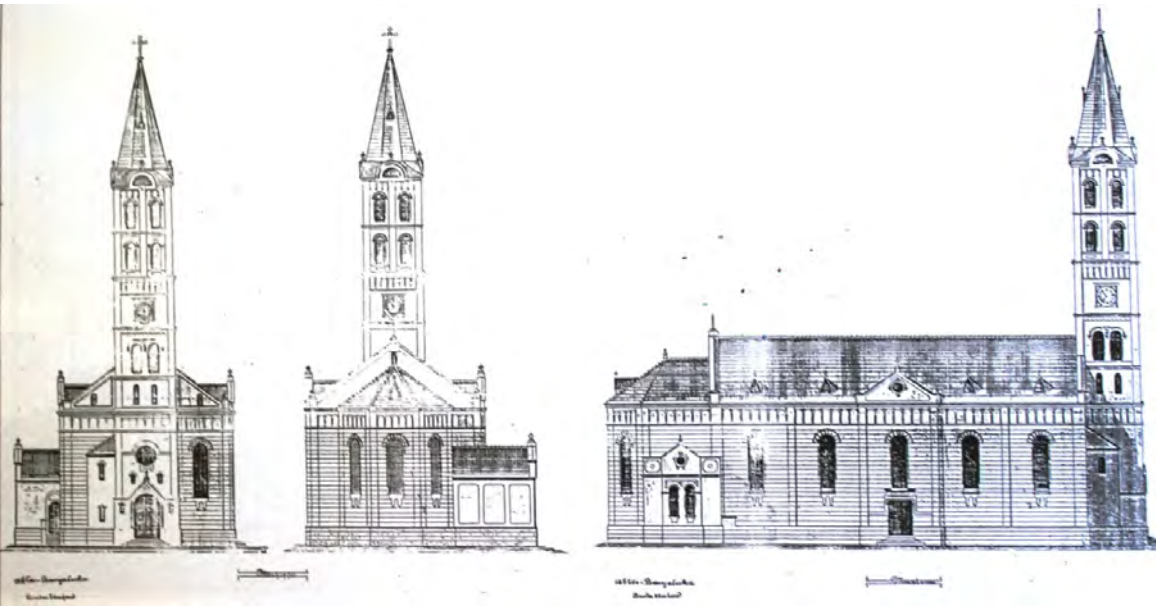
Church of The Resurrection of the Blessed Virgin Mary, first church; entrance, apse and side elevation views.
